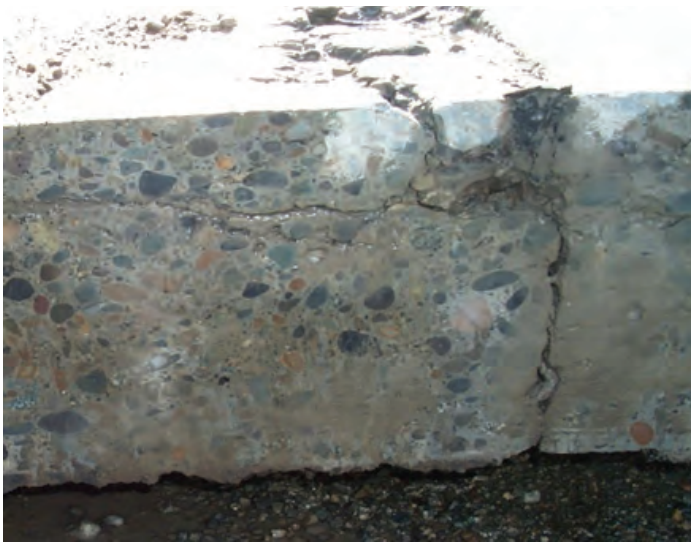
Example of delamination spalling (Source: Washington State)
